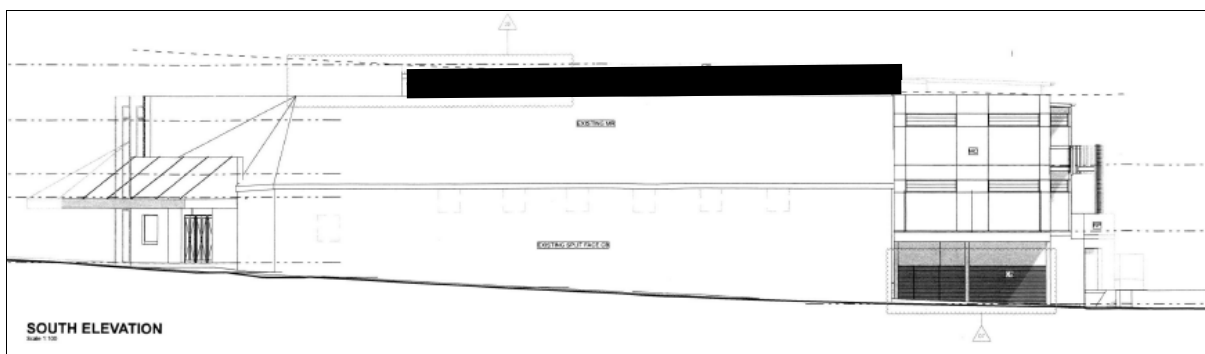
Southern Elevation of the approved development (cinema 2 roof projection highlighted in black)
